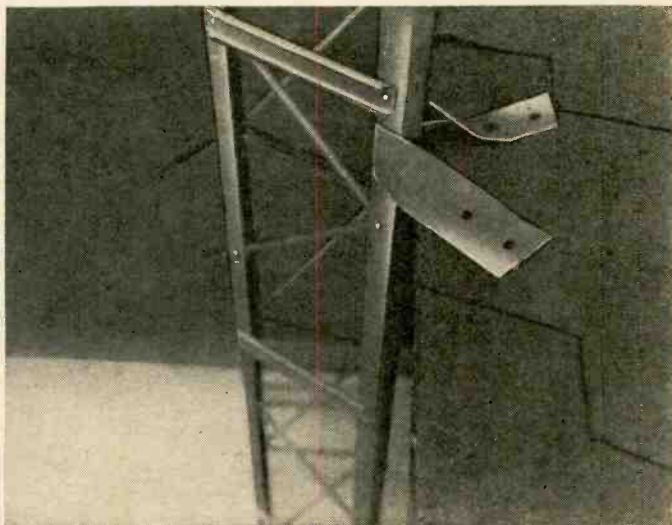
A sheet-metal strap is used to fasten tower to eaves of house, using heavy brass screws or lag screws.
